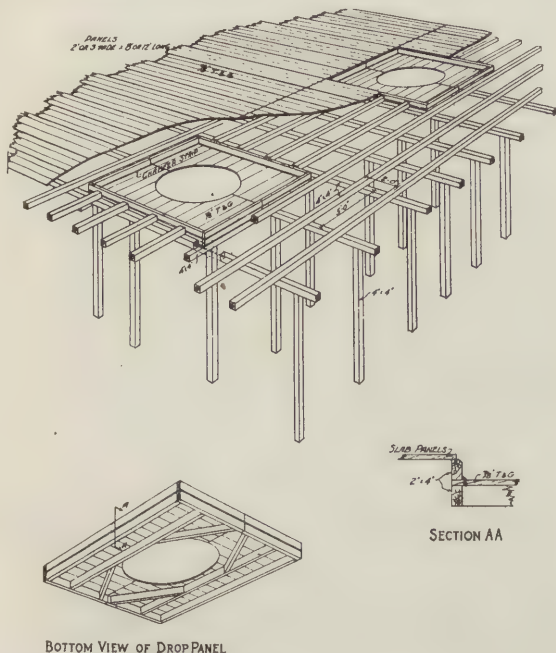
Flat slab construction—Forms for flat slab construction: depressed heads resting directly on stringers.
